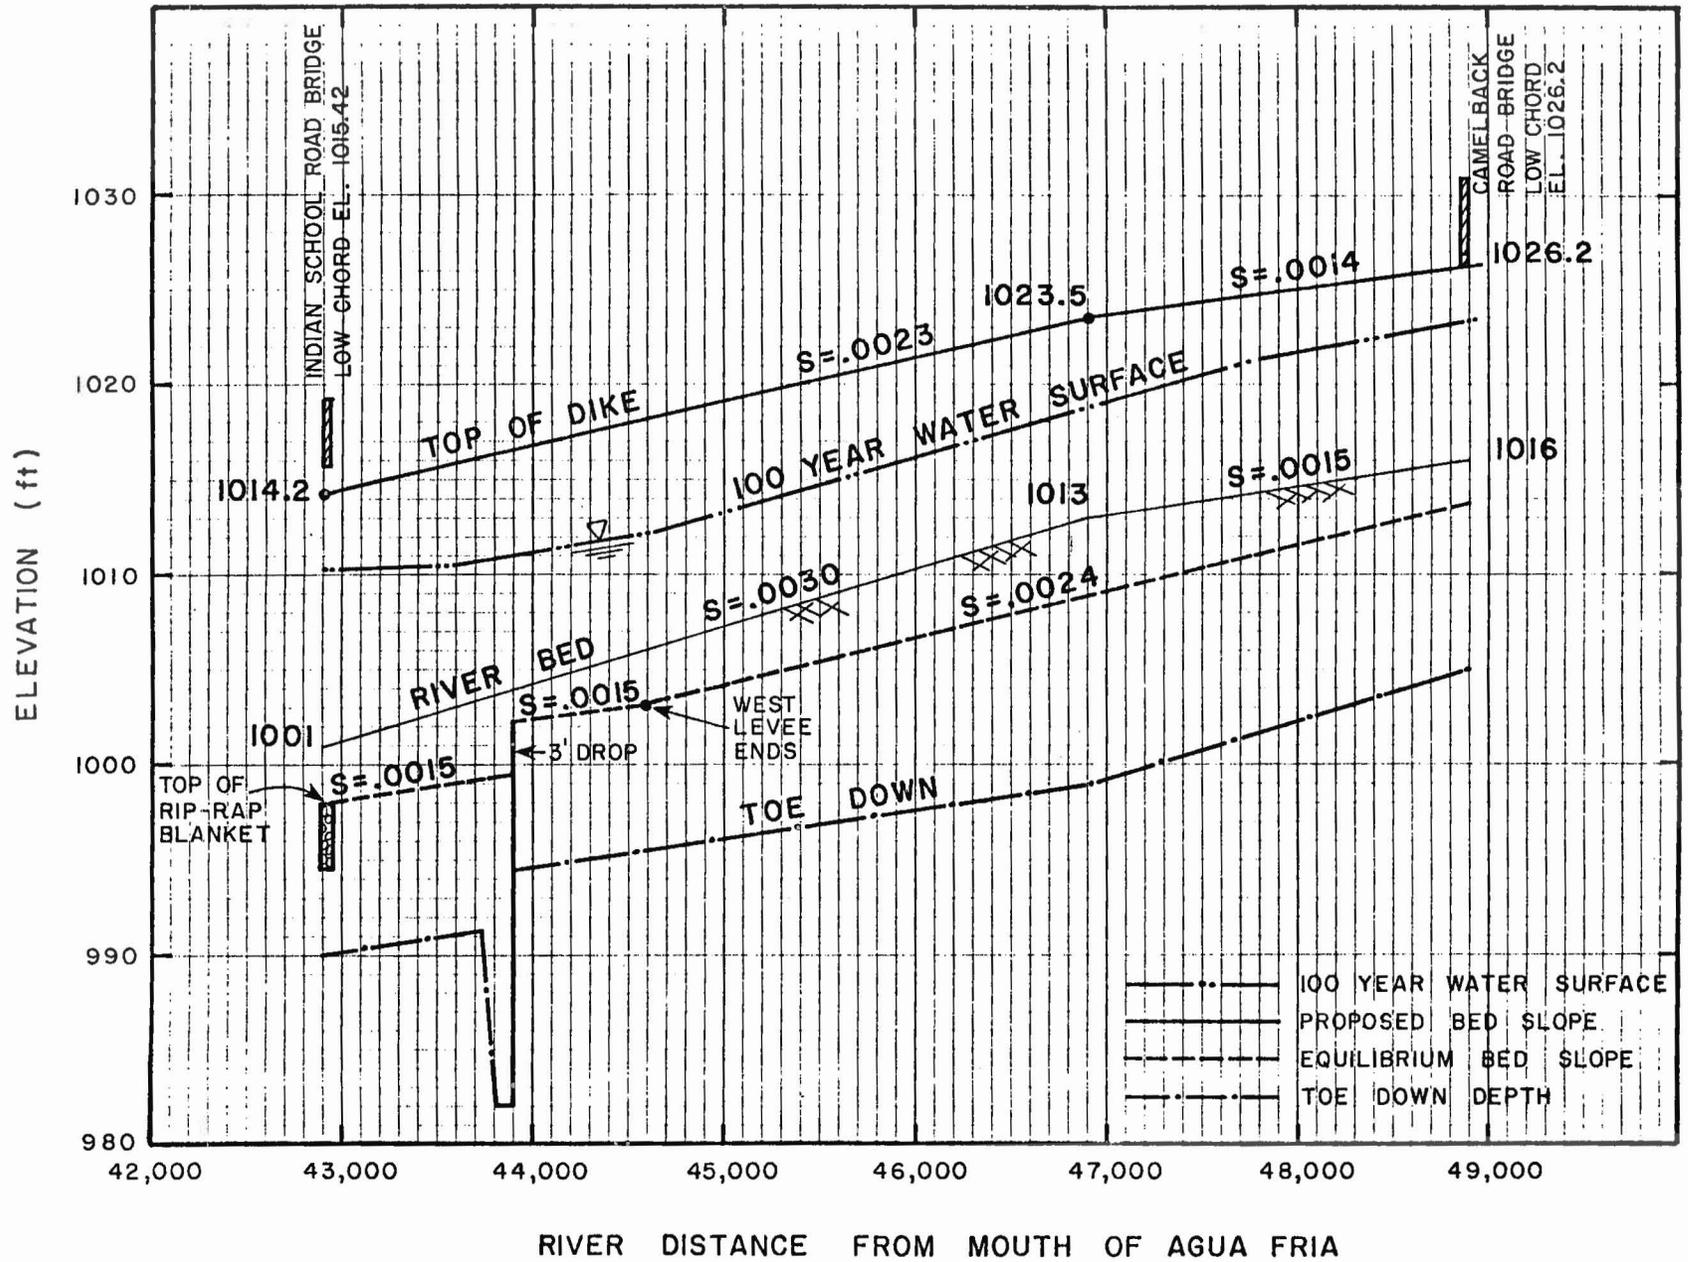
Proposed bed profile, equilibrium bed profile, 100-year water surface elevation, levee heights and toe down depths between Camelback and Indian School Roads for Alternative 1.
